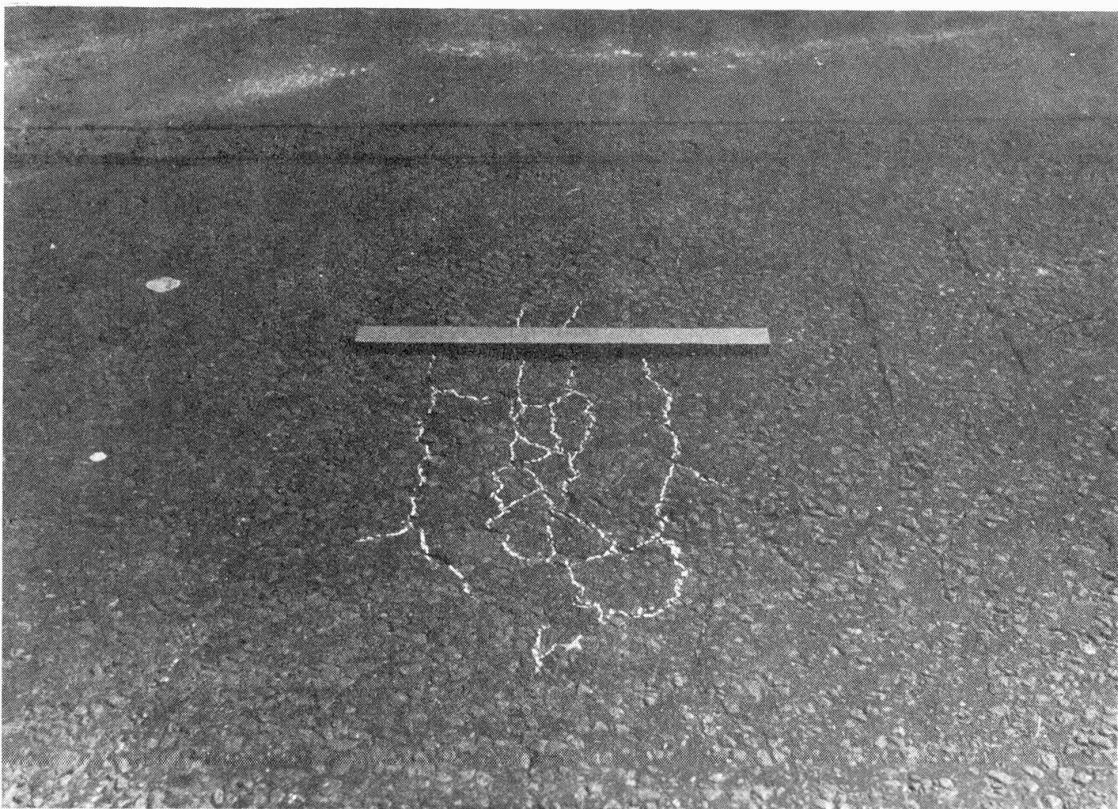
DEFORMATION AND CRACKING IN ROLLED ASPHALT OVER GRITTED EPOXY RESIN,
